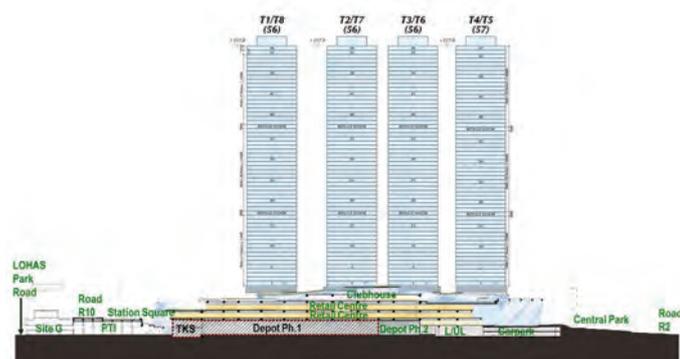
Section Plan of LOHAS Park (Source: Ronald Lu & Partners)
